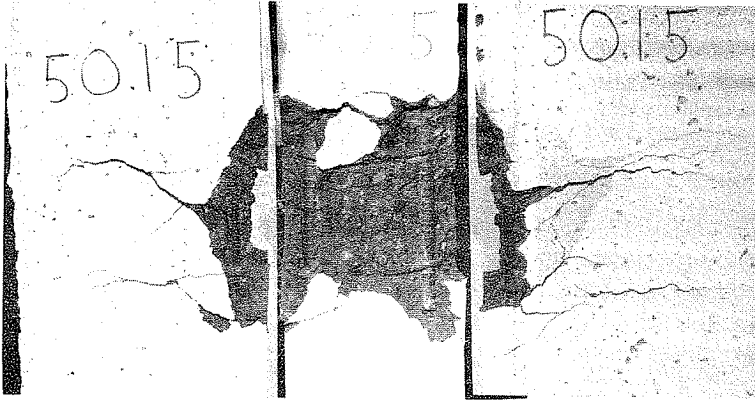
Failure of S.B.-specimen No. 50/15.
